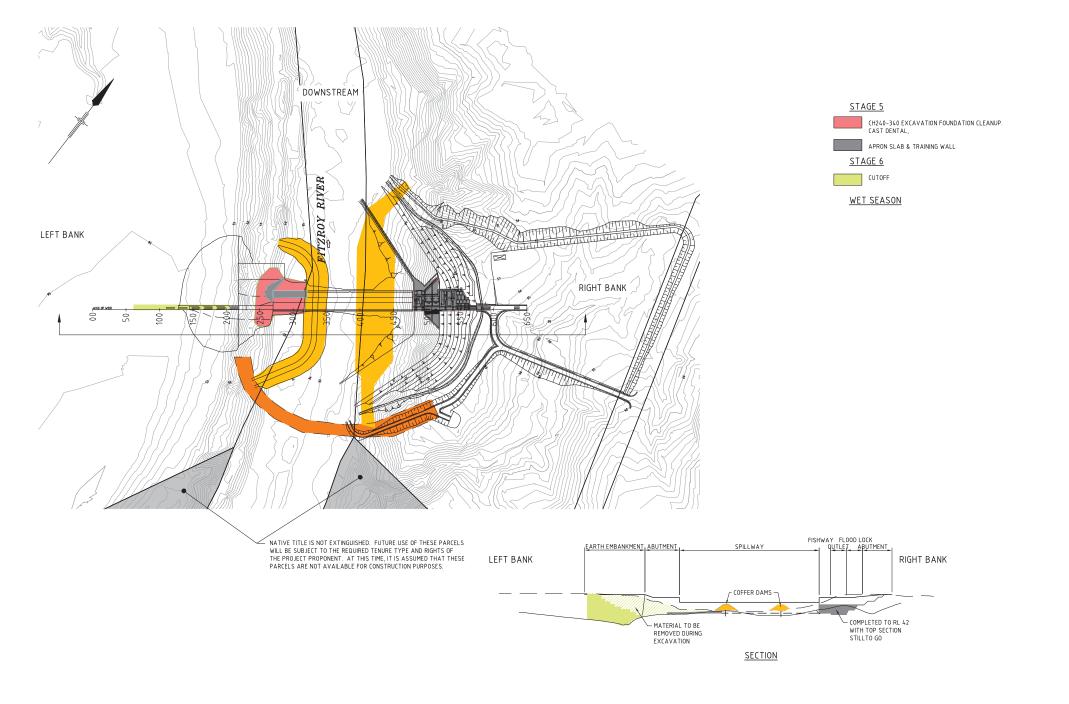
Rookwood Weir construction sequencing (Sheet 2 of 4)
